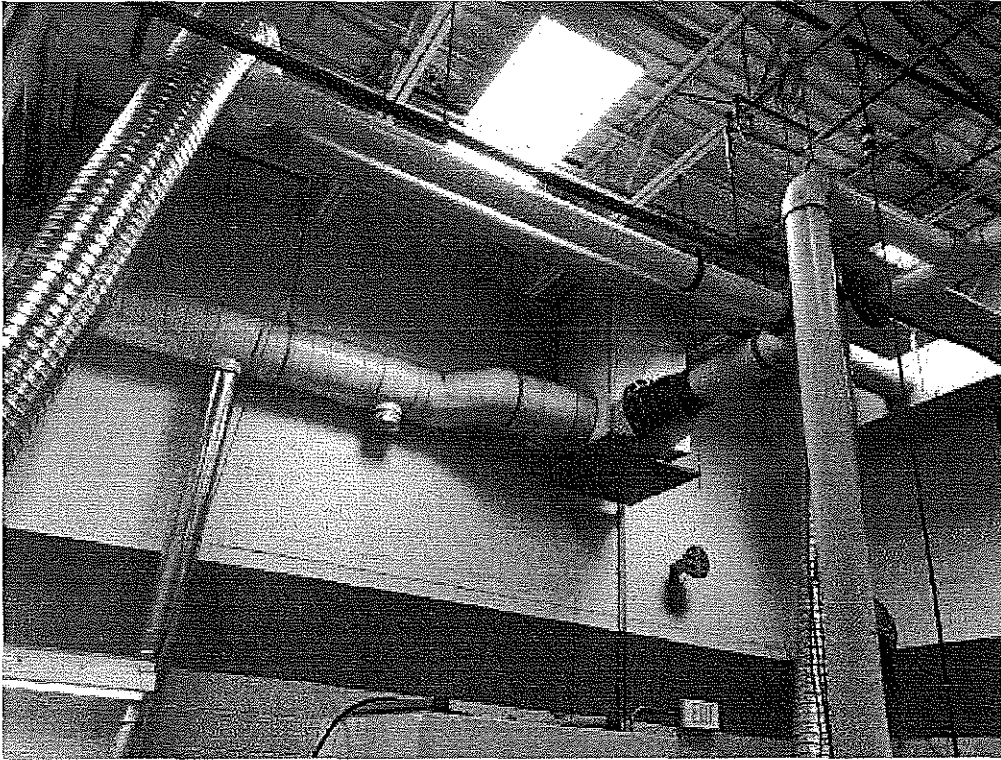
(Solder Room Exhaust) : Solder Room Exhaust
